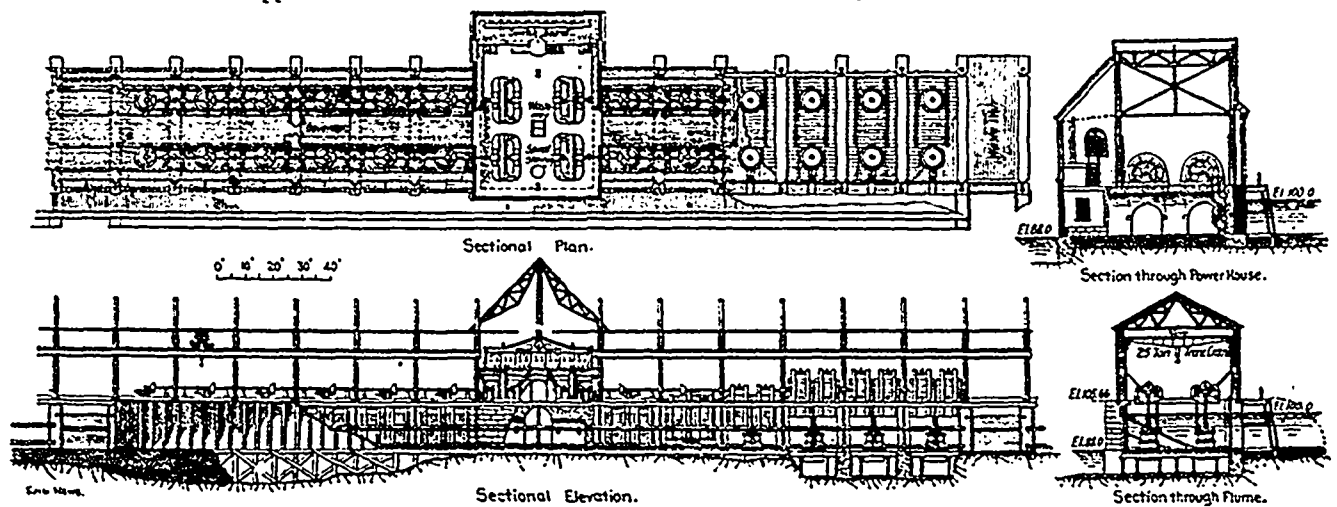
DIVISIONS THREE AND FOUR OF MAIN DAM, SHOWING PLAN, ELEVATION AND SECTION OF POWER HOUSE AND TURBINE SETTINGS.
